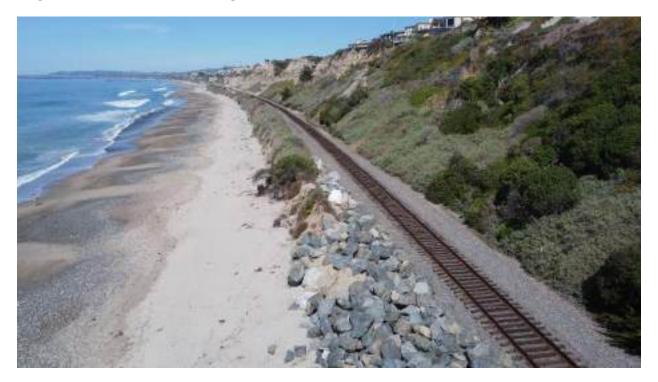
Proposed New Engineered Revetment Would Replace Existing Eroded Berm and Vegetation
